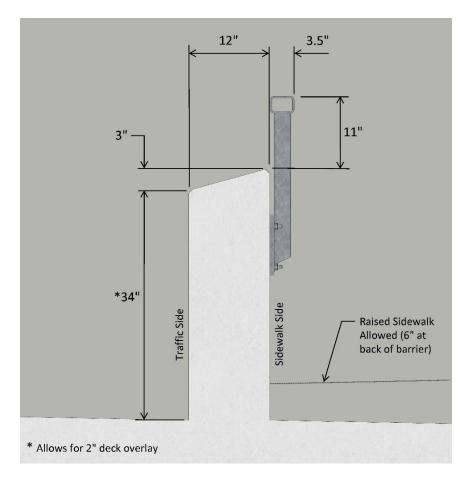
Iowa DOT "BMBR" TL-2 separation railing (see Project No. NHSX-030-5(277)--3H-85, Design No. 123 Story for a railing application)
